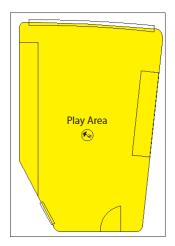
Levine 9th floor Play Room Plan. Not to scale.
